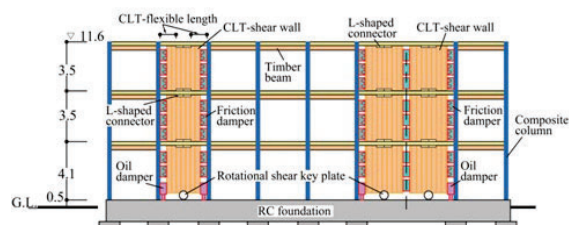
Shear wall, damper, and rotational shear-key plate in a frame
